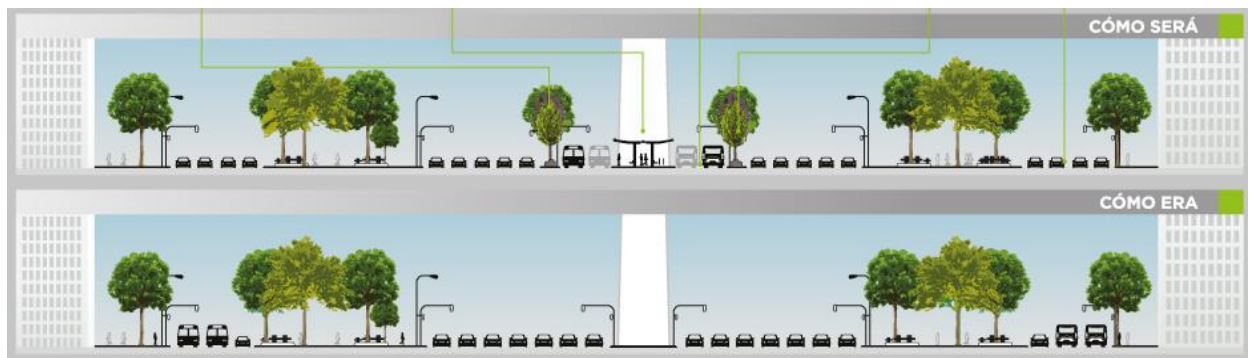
Cross section of Avenida 9 de Julio – at present (upper picture) and in the past (lower picture) (28)
